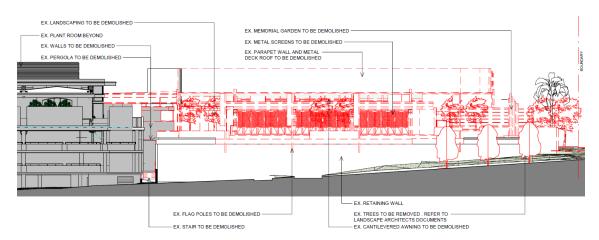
Proposed demolition on northern elevation (Hawkesbury Avenue) (Source: Altis Architecture)
